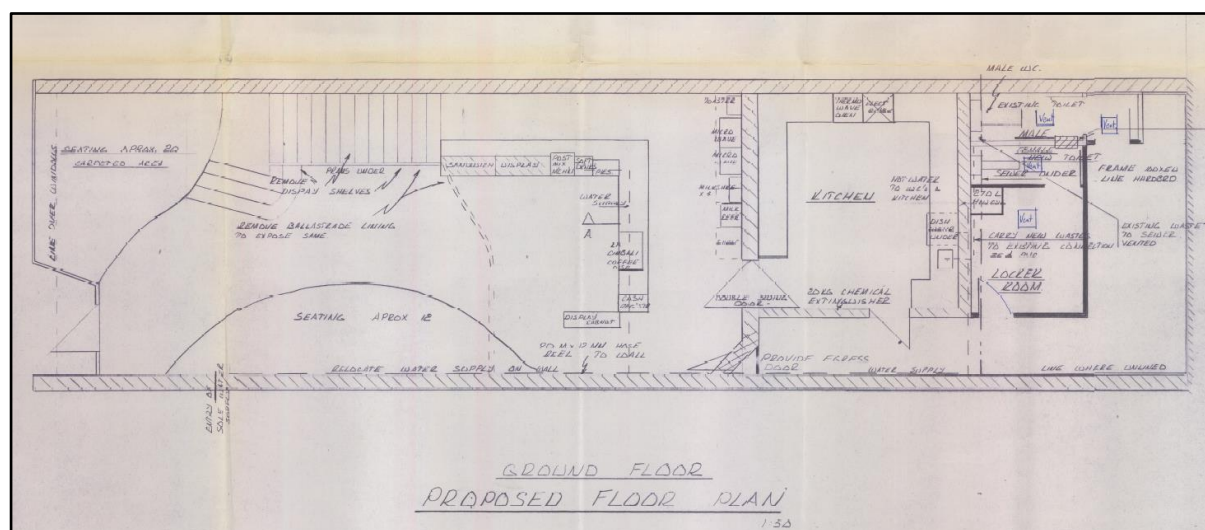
Detail from 1984 plan of the building at 50 Tay Street, showing the proposed new floor plan to accommodate tea rooms (Gieseg, 1984).
